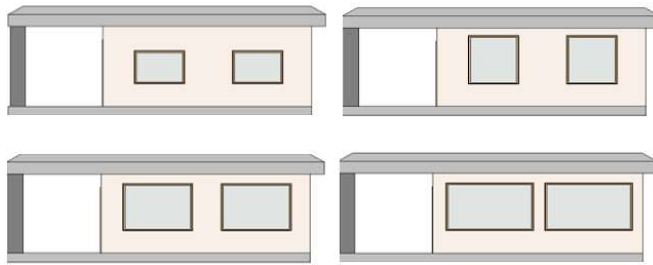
Illustrative Example for Windows Placed at 750mm above the Floor on West/East-facing Wall. Elevations from Top Left to Bottom Right Indicate a WWR of 20%, 30%, 40% and 50%.
